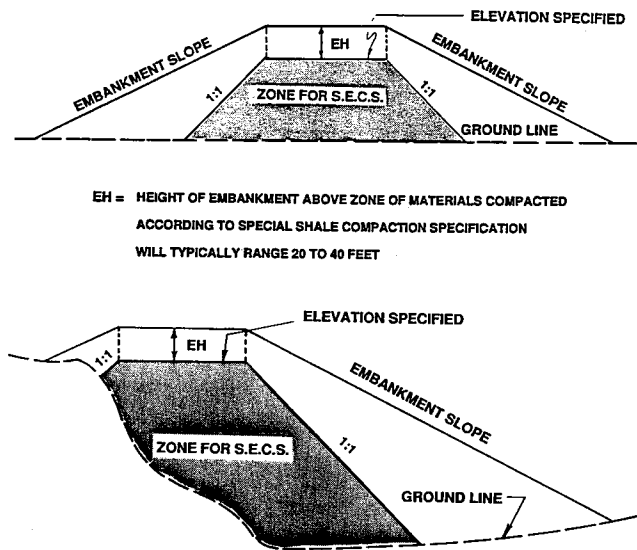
Typical Cross Sections Illustrating Zoned Embankment Configurations.
